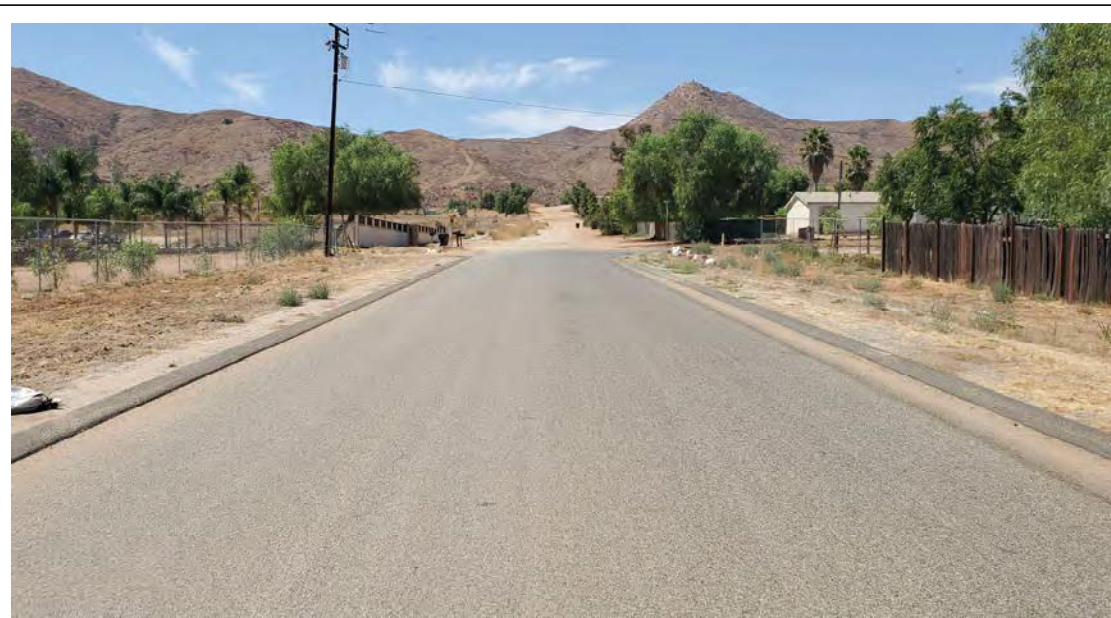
View of a developed roadway in foreground, exotic ornamental/developed adjacent to the roadway, and an access road mapped as bare ground in the background. Photograph taken from Steele Peak Drive, facing west.
